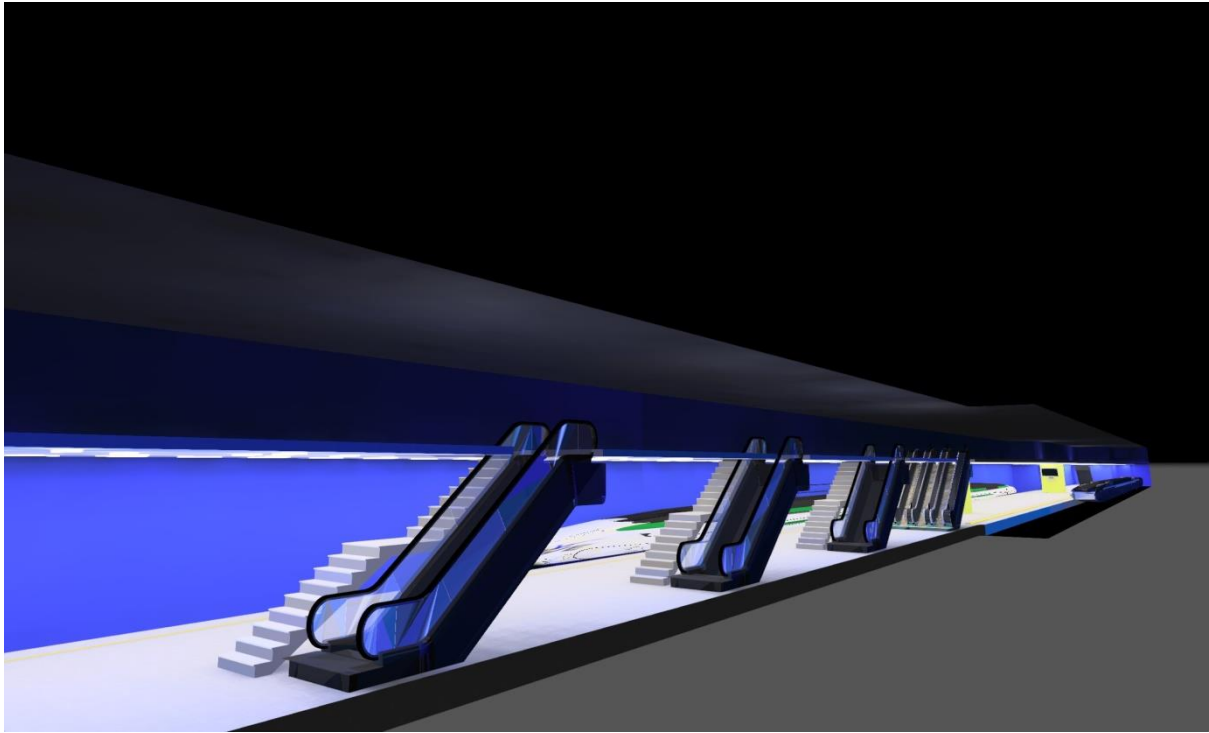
Typical Underground Metro Platform 3D Rendering
